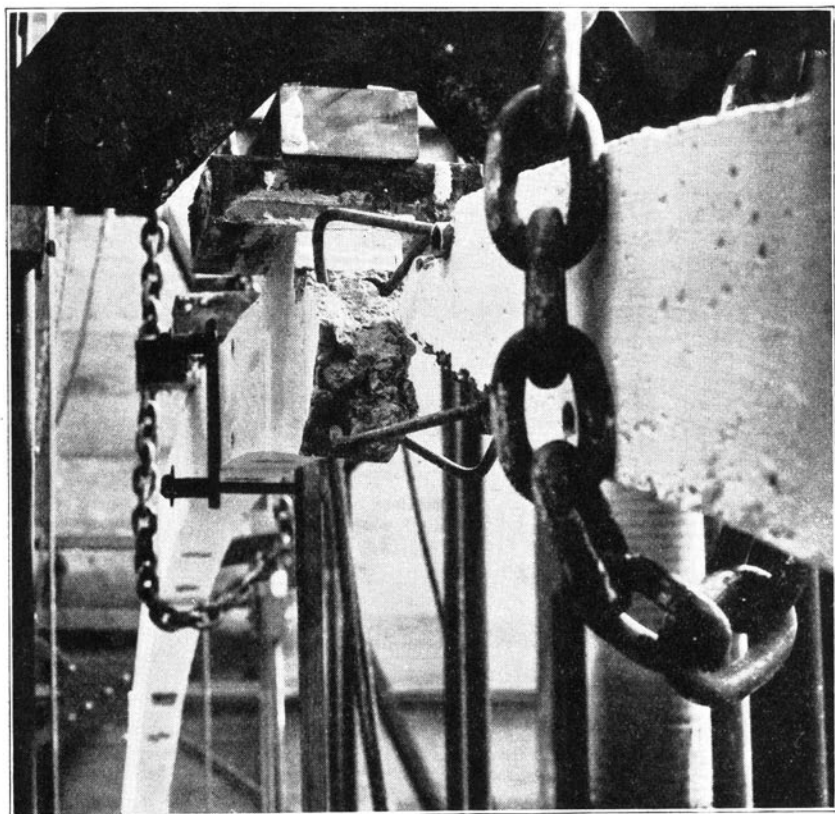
BUCKLING FAILURE OF ARCH 26-4
